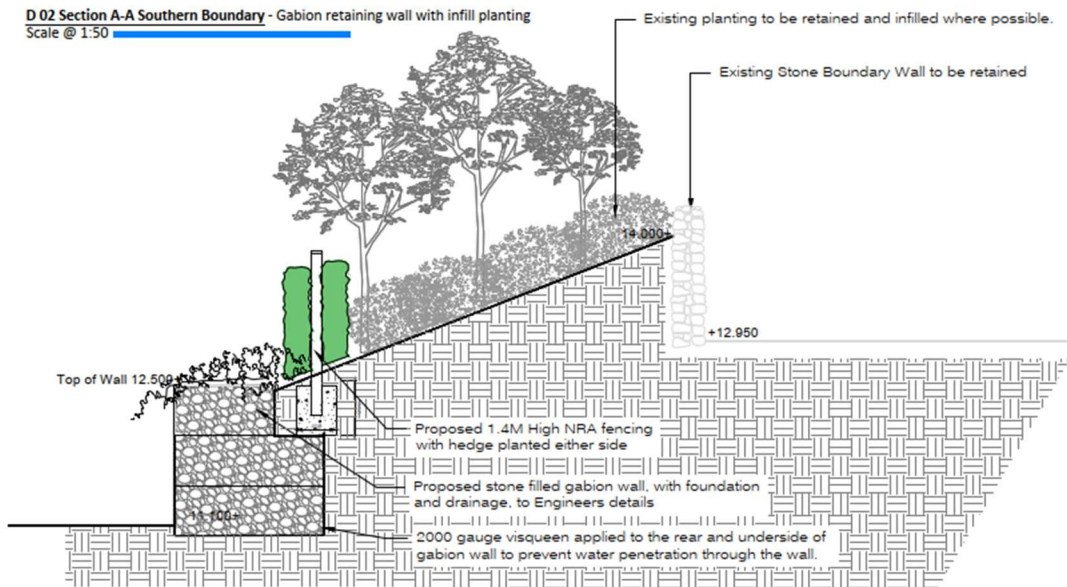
Cross section through southern boundary (Source: O’ Mahony Pike, 2025a)
